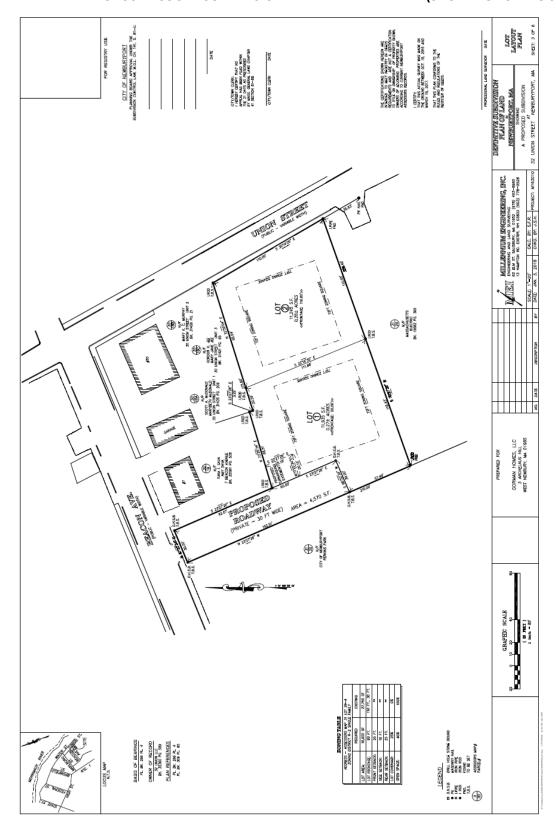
PROPOSED COURT SUBDIVISION PLAN WITH A WAIVER (SHOWING HOUSE LOCATIONS)
